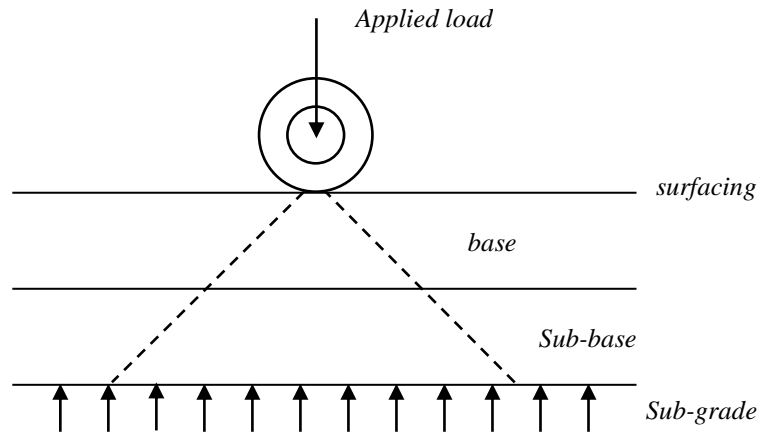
Load distribution through a flexible pavement. (F.G. Bell, 1975)
